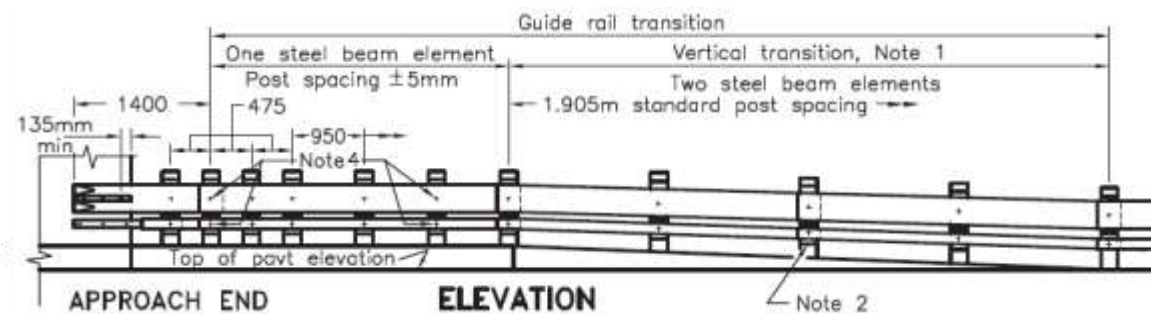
Legacy SBGR with Channel Connection to Concrete Parapet Wall, See applicable standard drawing for Notes
